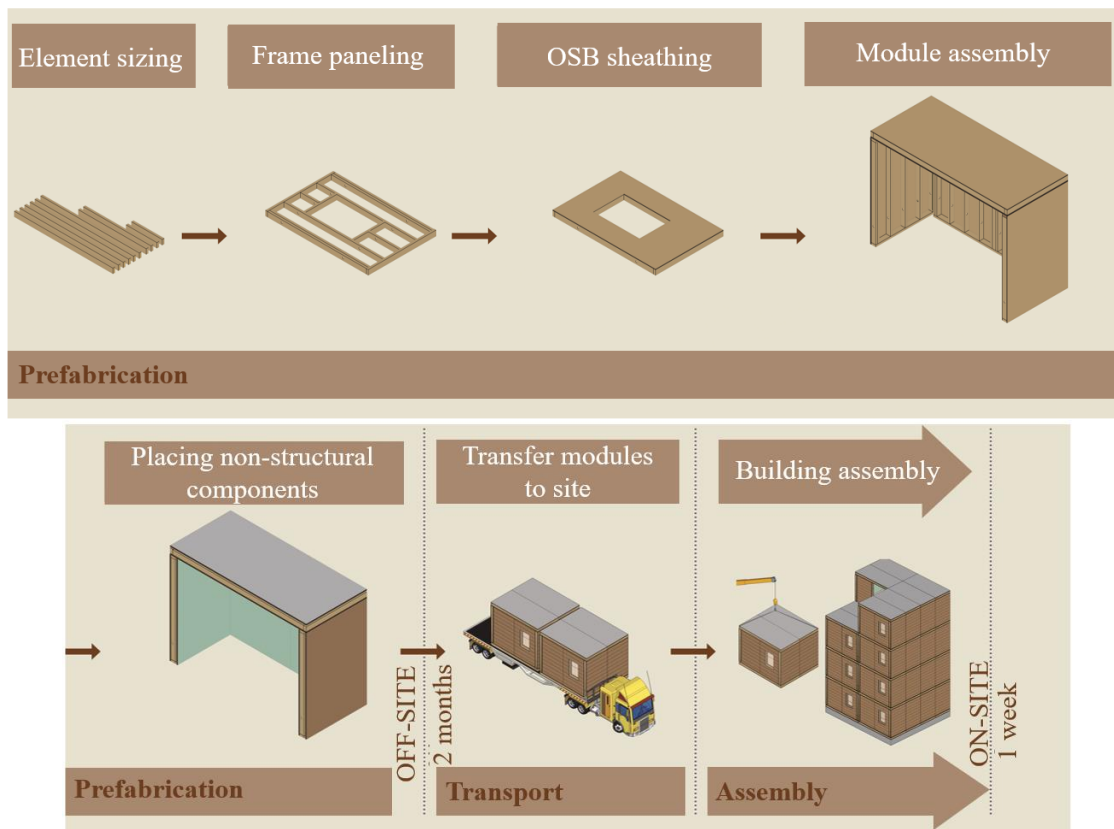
Scheme of the manufacture and construction of the Peñuelas Tower building
